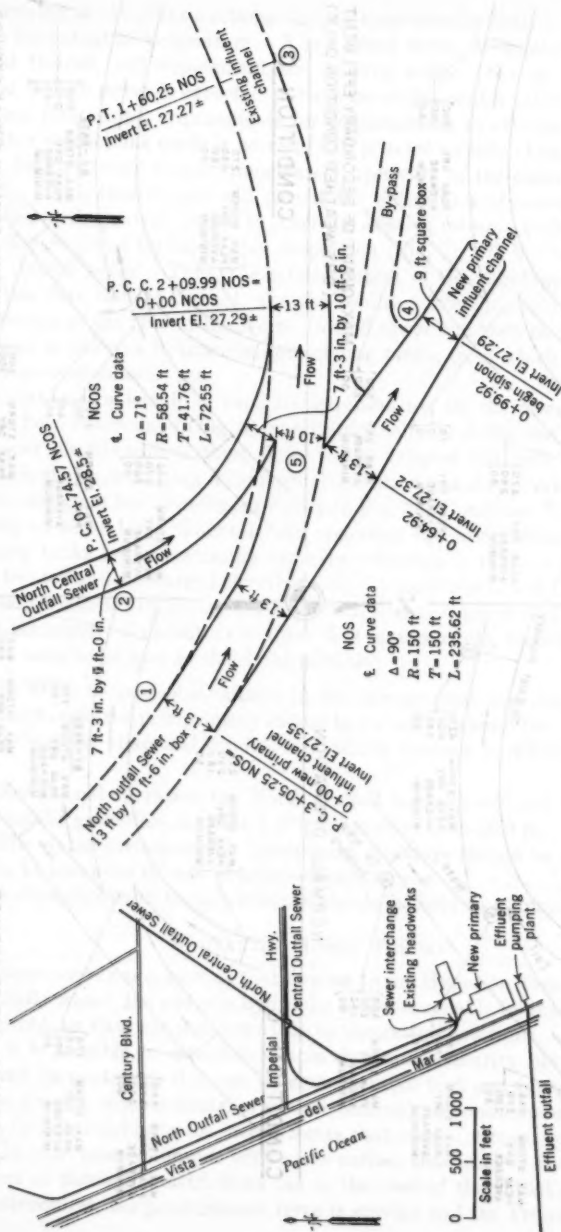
SEWERS TO THE HYPERION TREATMENT PLANT
